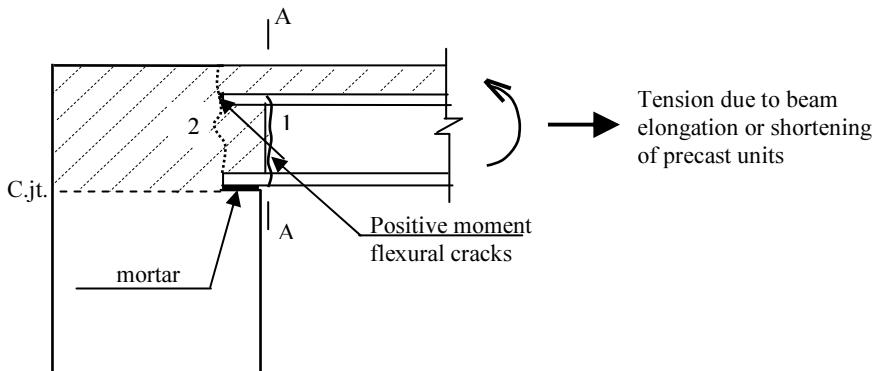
Support on cover concrete or on concrete ledge tied into the supporting element
